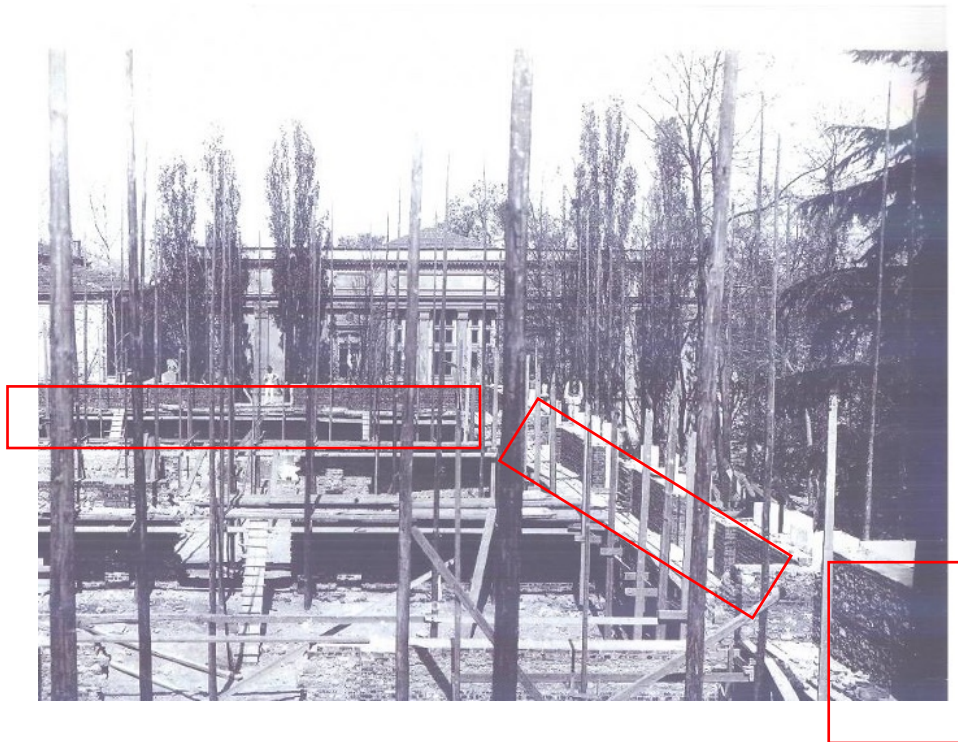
Detail from the right of Figure 171 show the brick beams and stone masonry in load bearing wall system of 3<sup>rd</sup> construction phase of IAM (source: Restitution Report of IAM prepared by *Seçkin Mimari Hizmetleri*, IDSM Archive)
